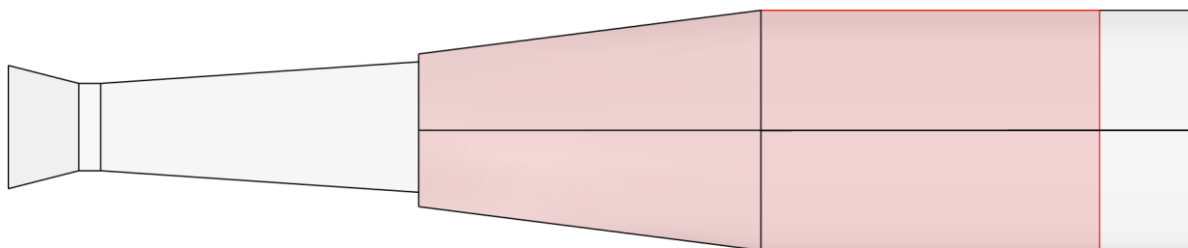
Ramp design approach with continued inclination in the diffuser and 6° angle in the constant sand trap section, plan view, detail
